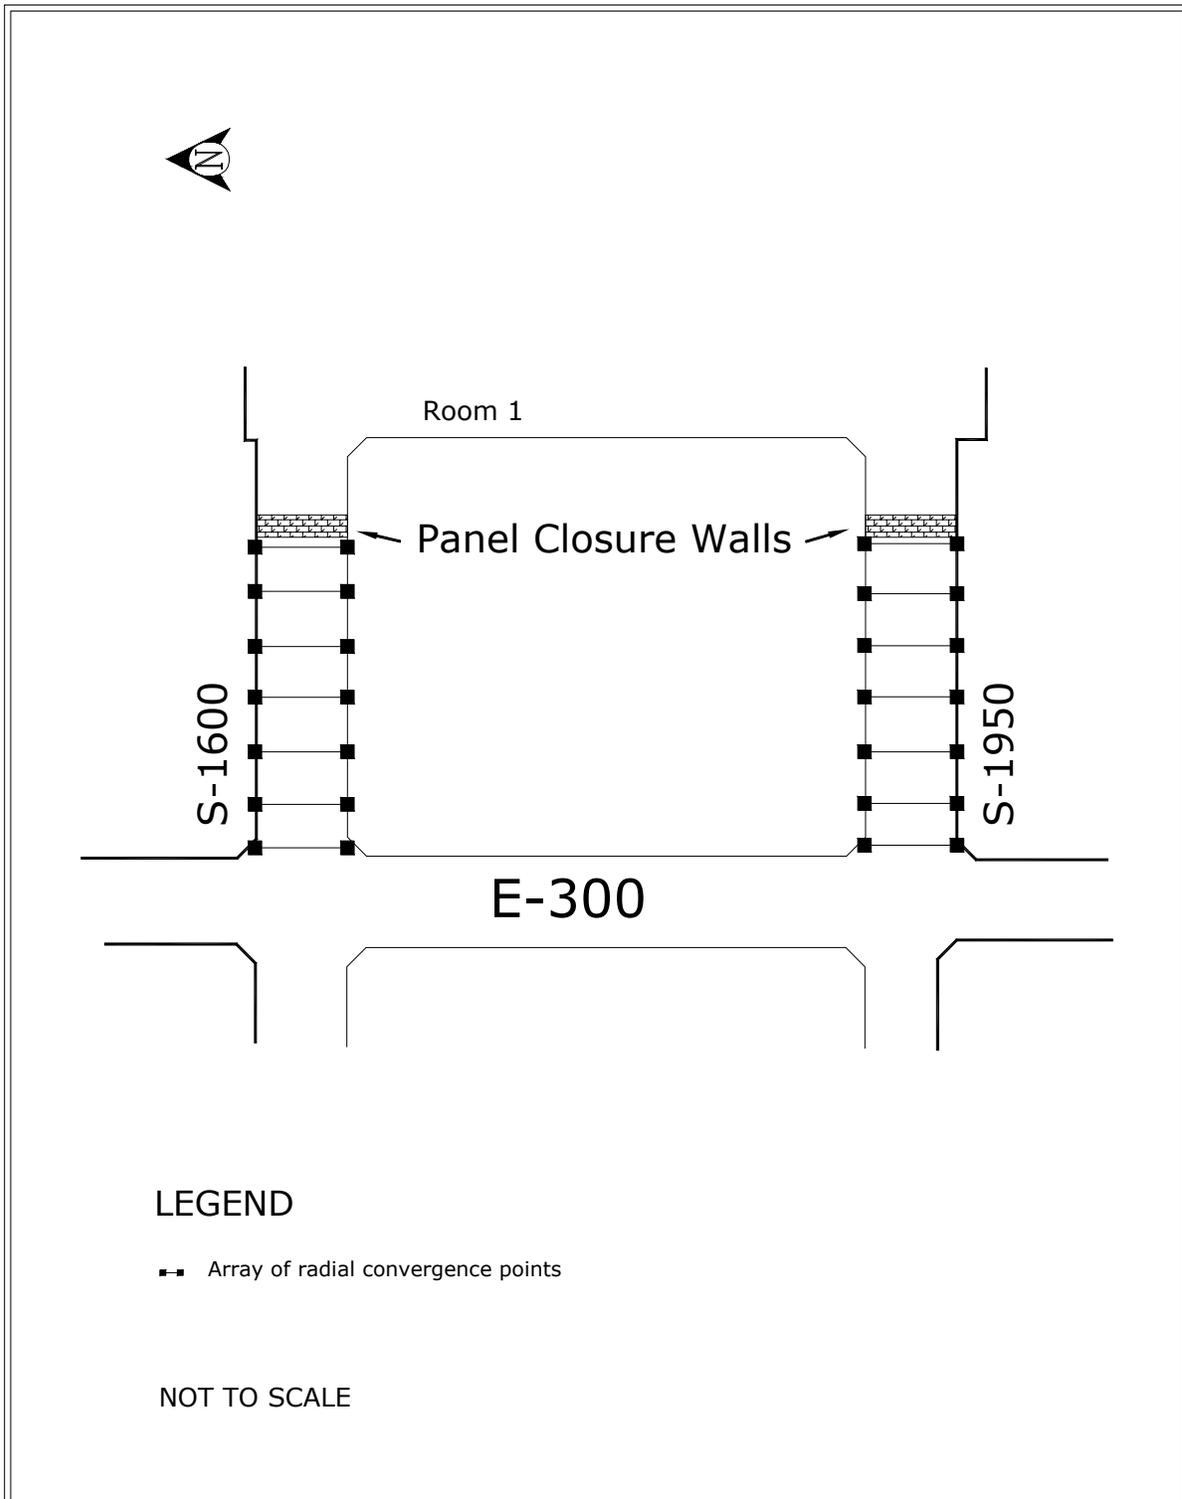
Location of Panel 1 Entry Geotechnical Instruments
